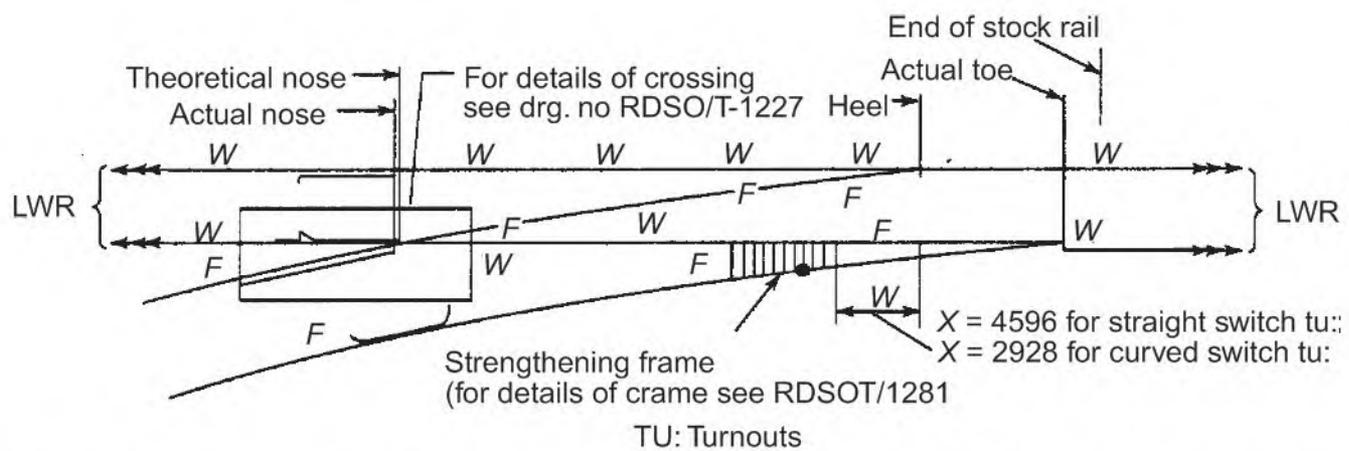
LWR through points and crossings: W, welded joint; F, fishplated joint
